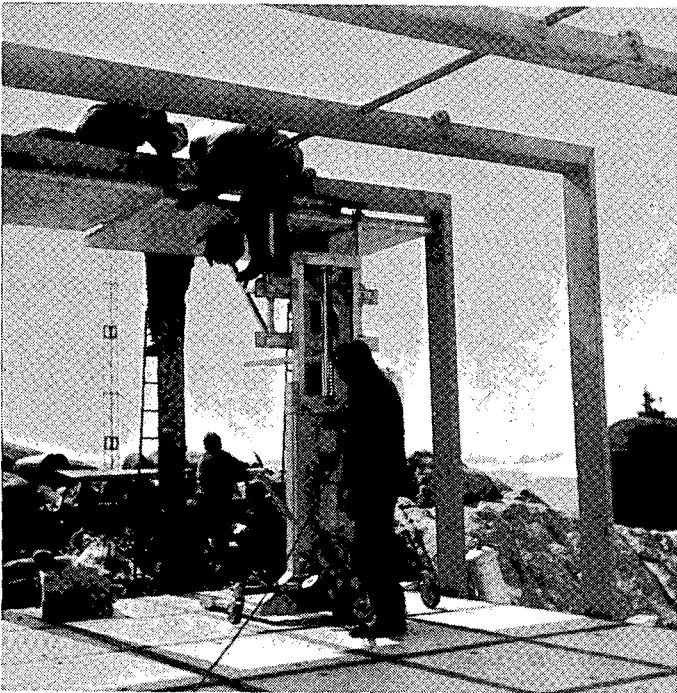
Laying of roof panel. Gluing of 2 consecutive panels of a row. Panel is lifted by lift-truck. Temporary wind-braces will be lay down after laying of panels. The floor in concrete slabs (power plant building).
